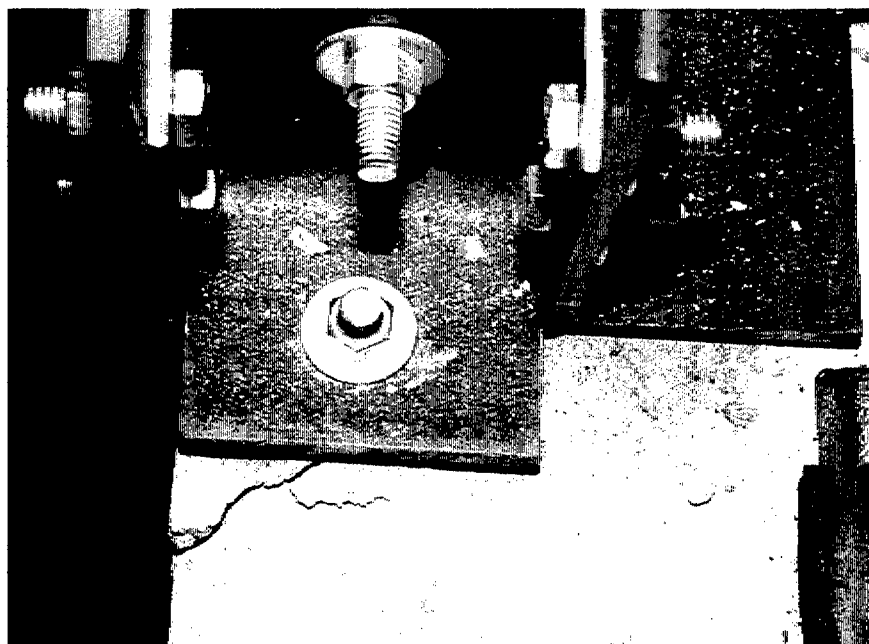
Base of Second Story, SW Column, Post-E200N
